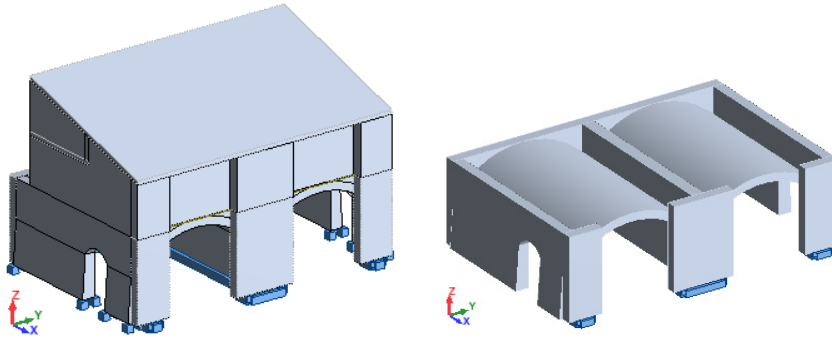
Numerical model. Up: the entire structure; Bottom: walls and vaults in puddingstone concrete of the 1st story
